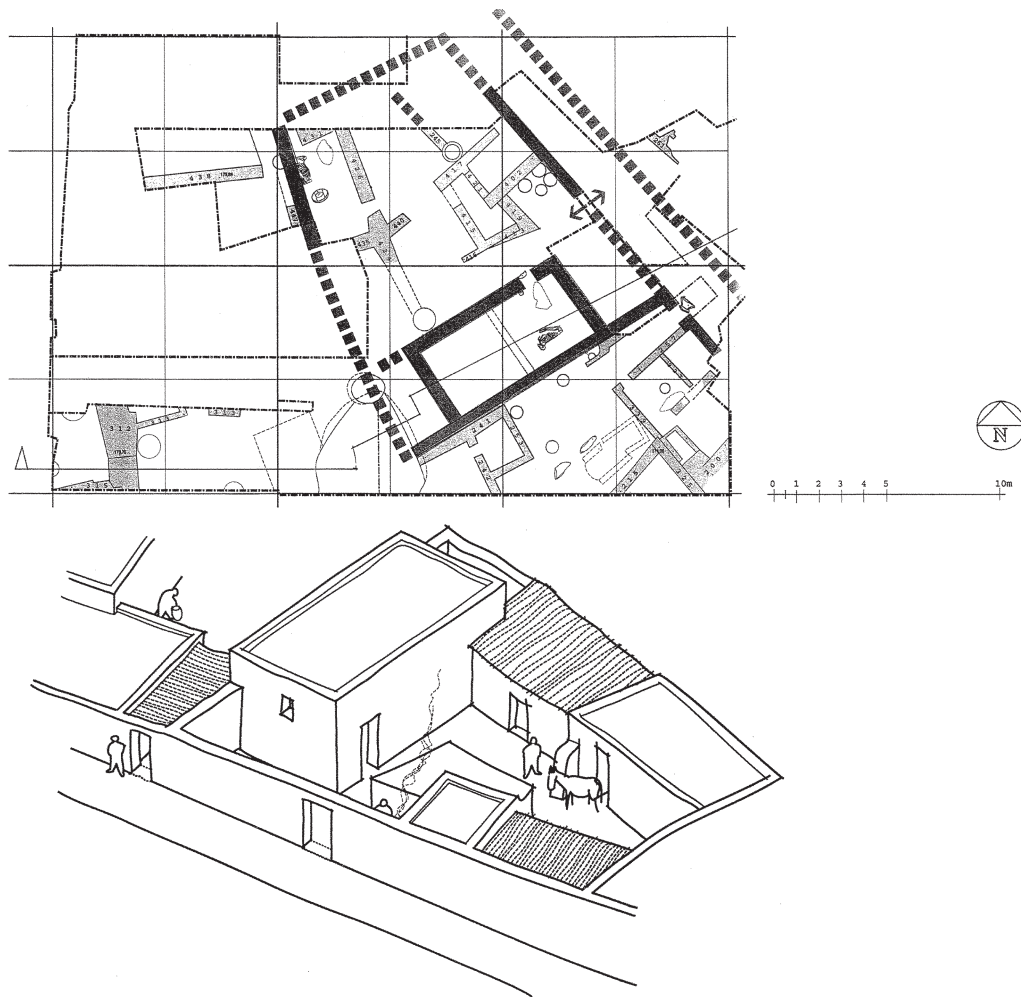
The House of the Donkey and the Wheel (City I), plan and reconstruction.
